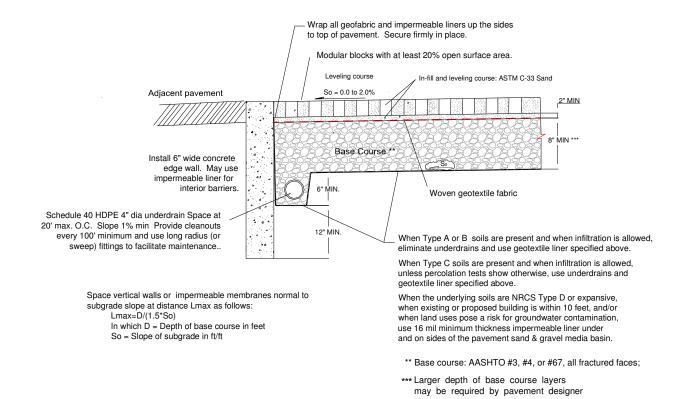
Modular Block Pavement (MBP) – Typical Cross-Section
